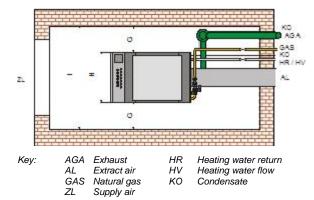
Sample installation designs – depiction without fittings and safety assembly (dimensions in mm)
